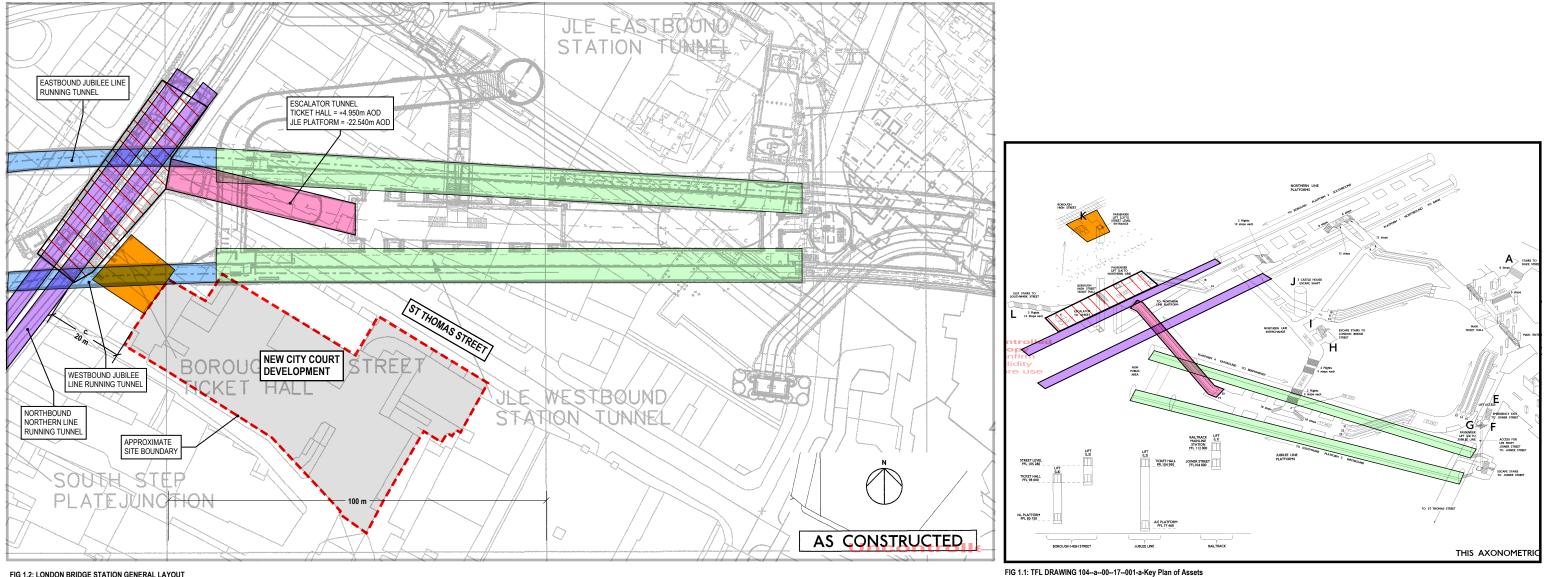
LONDON BRIDGE STATION GENERAL LAYOUT REFERENCE 104--a--00--10--200-a (SCALE 1:1000)
